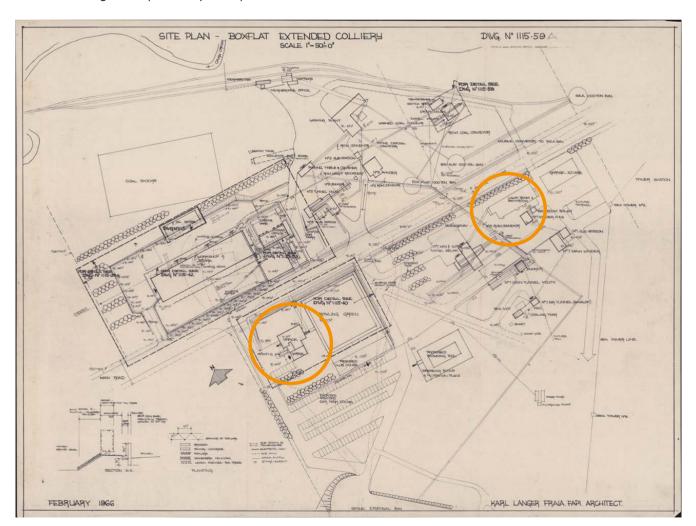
The Box Flat Colliery. Site plan from 1966. Note some elements are shown as proposed including a club room and pool between the Mine Office and the Mine Bath House on the southern side of Swanbank Road. The Office and Bath House are highlighted. (Karl Langer architect, UQFL 158).
